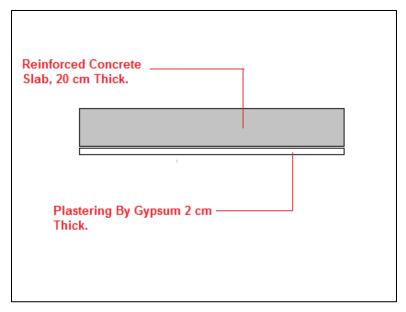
Section in the roof of Gullan & Harsham houses (Kareim, 2018)
